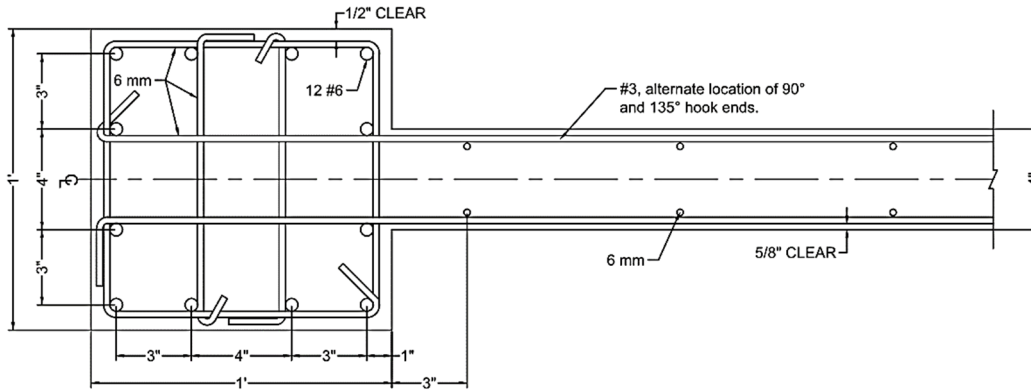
Shear Wall Specimen B8 – Cross Section (Oesterle et al. 1979)
